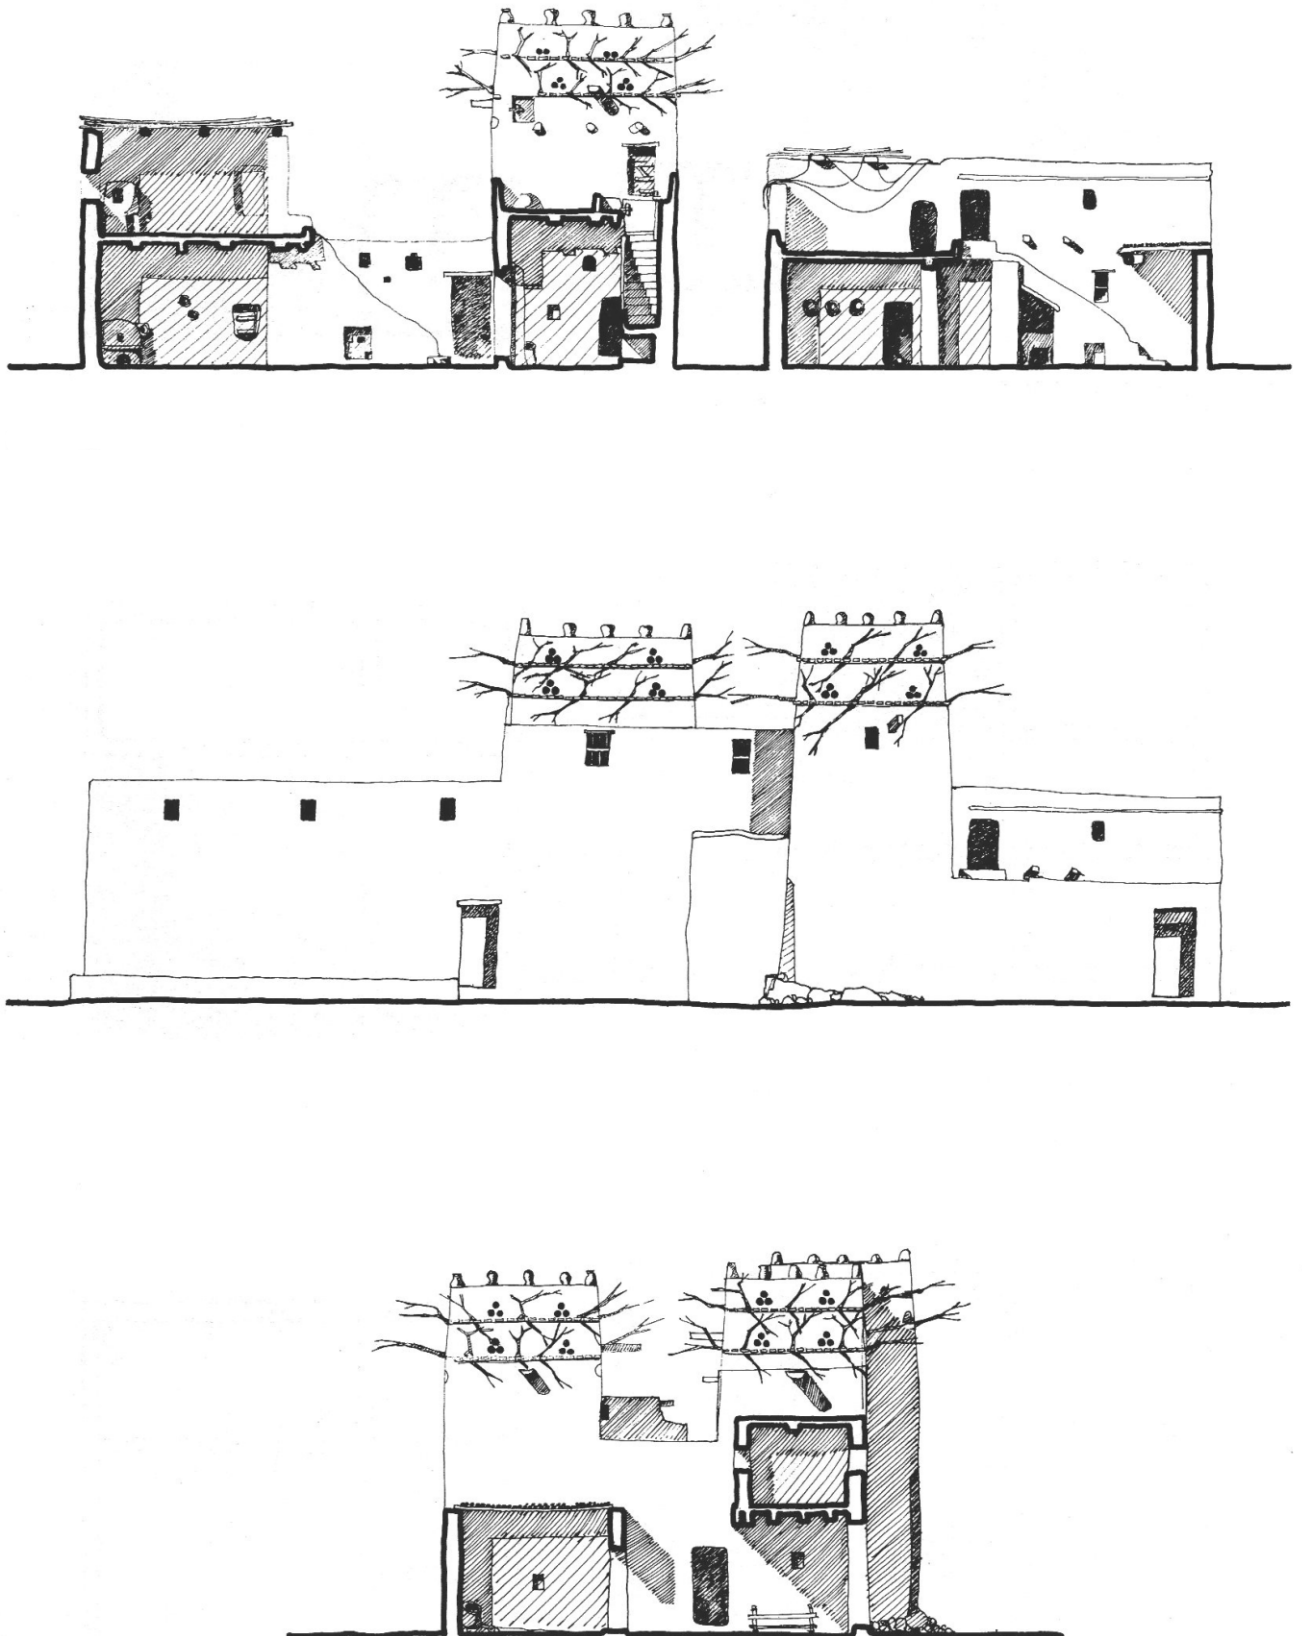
House of Hagra, Garas et Girgis and House of Tawfig and Safig. From top to bottom: section A-A, west elevation and section B-B (Henein 1988, 22).
